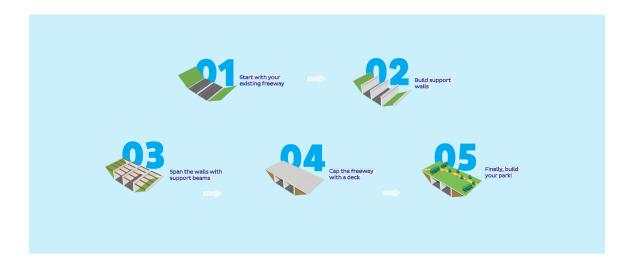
| Steps to building a freeway cap park (Graphical elements sourced and reworked from Space 134)
